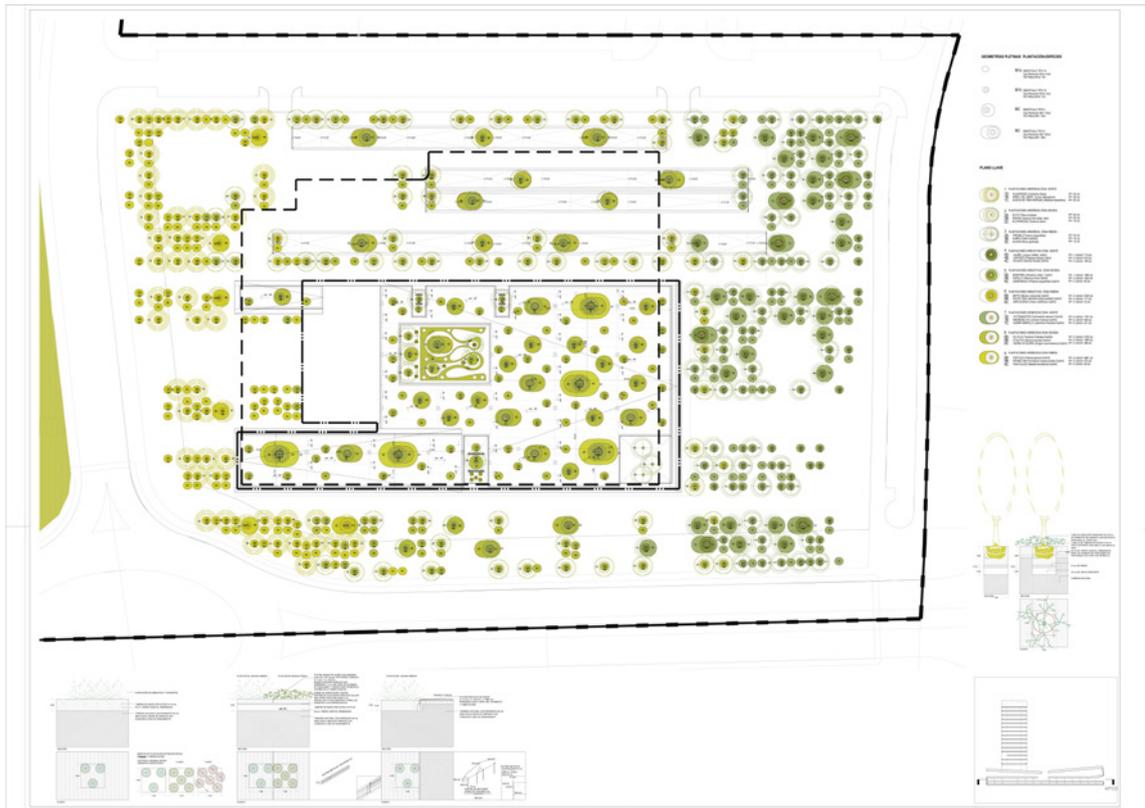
Dehesa landscape architecture of park, gardens and roof of Caja Badajoz (Badajoz, Spain), (© C.Jorge).
